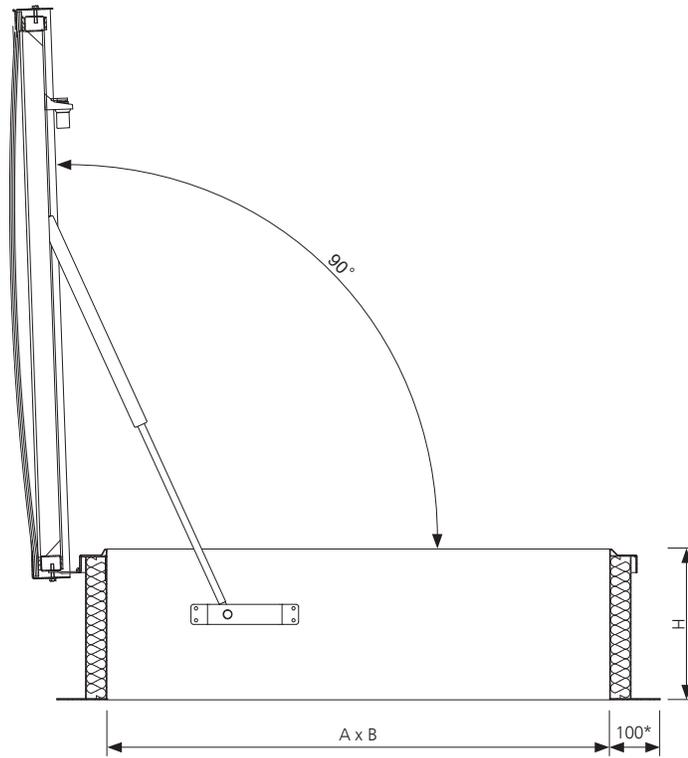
Section B-B of mcr PROLIGHT C roof hatch in open position, dimensions in mm
